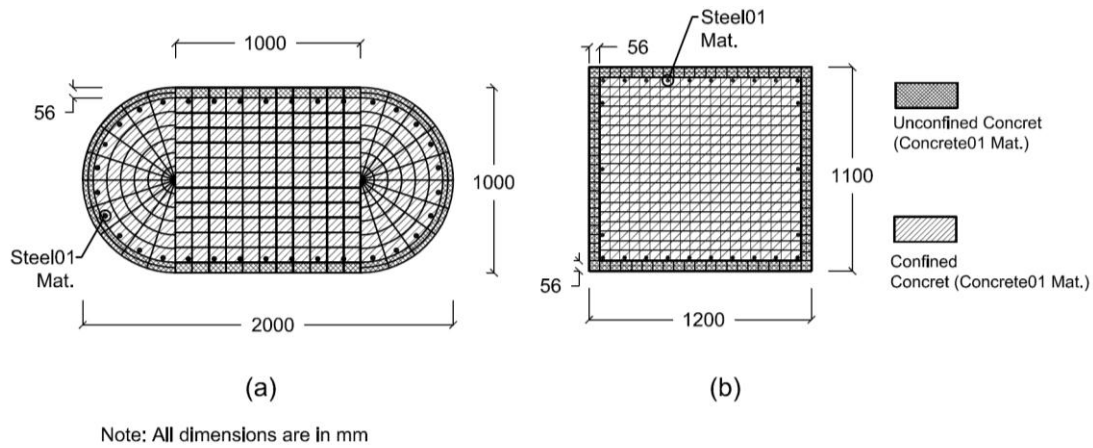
Discretisation of column and cap beam sections for fiber modelling.
